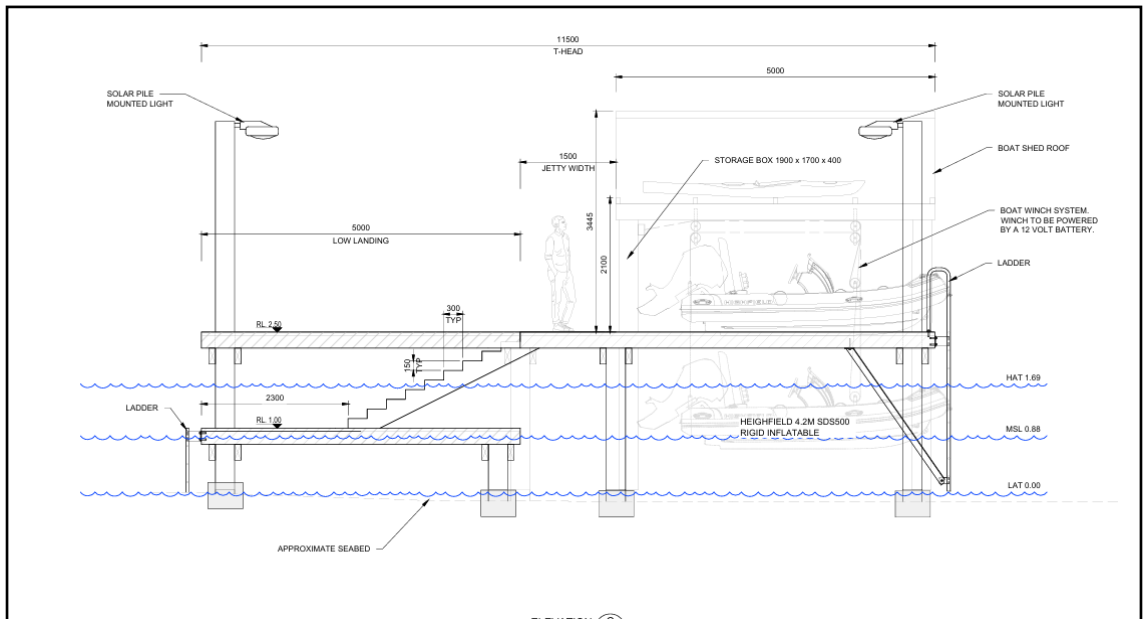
Elevation of the proposed jetty, t-head and boat shed (Burbury).
